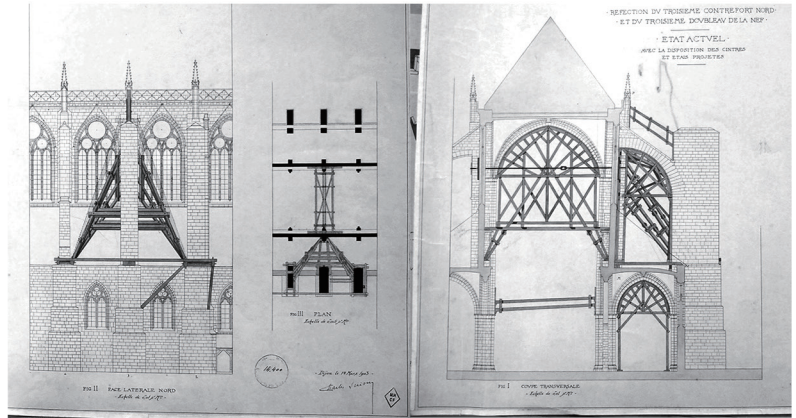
Case No. 3. Dijon, Saint-Bénigne abbey church, exterior elevation (left), plan (center) and section (right) showing the centering and consolidations (C. Suisse, 1903)
